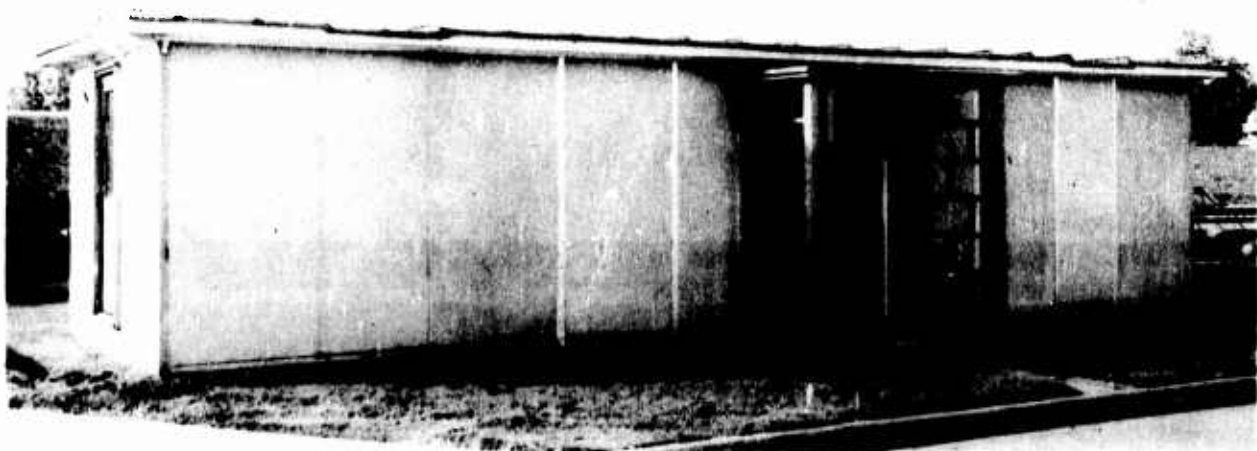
Original Forest Products Laboratory sandwich experimental unit. M 116 396
